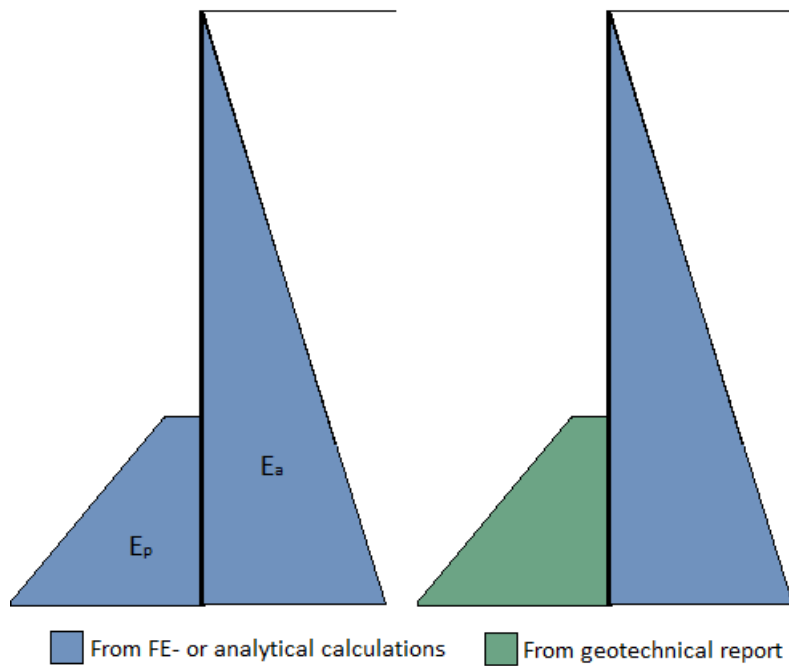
Earth pressure combinations, second excavation down to -14m. Left side is excavation side, right side is soil side.
